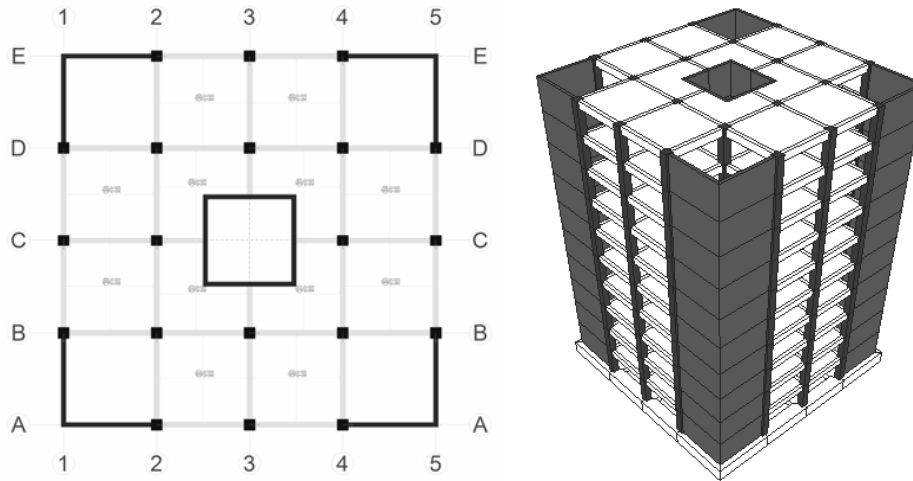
Structural plan and 3D view of parametric model IIIId
